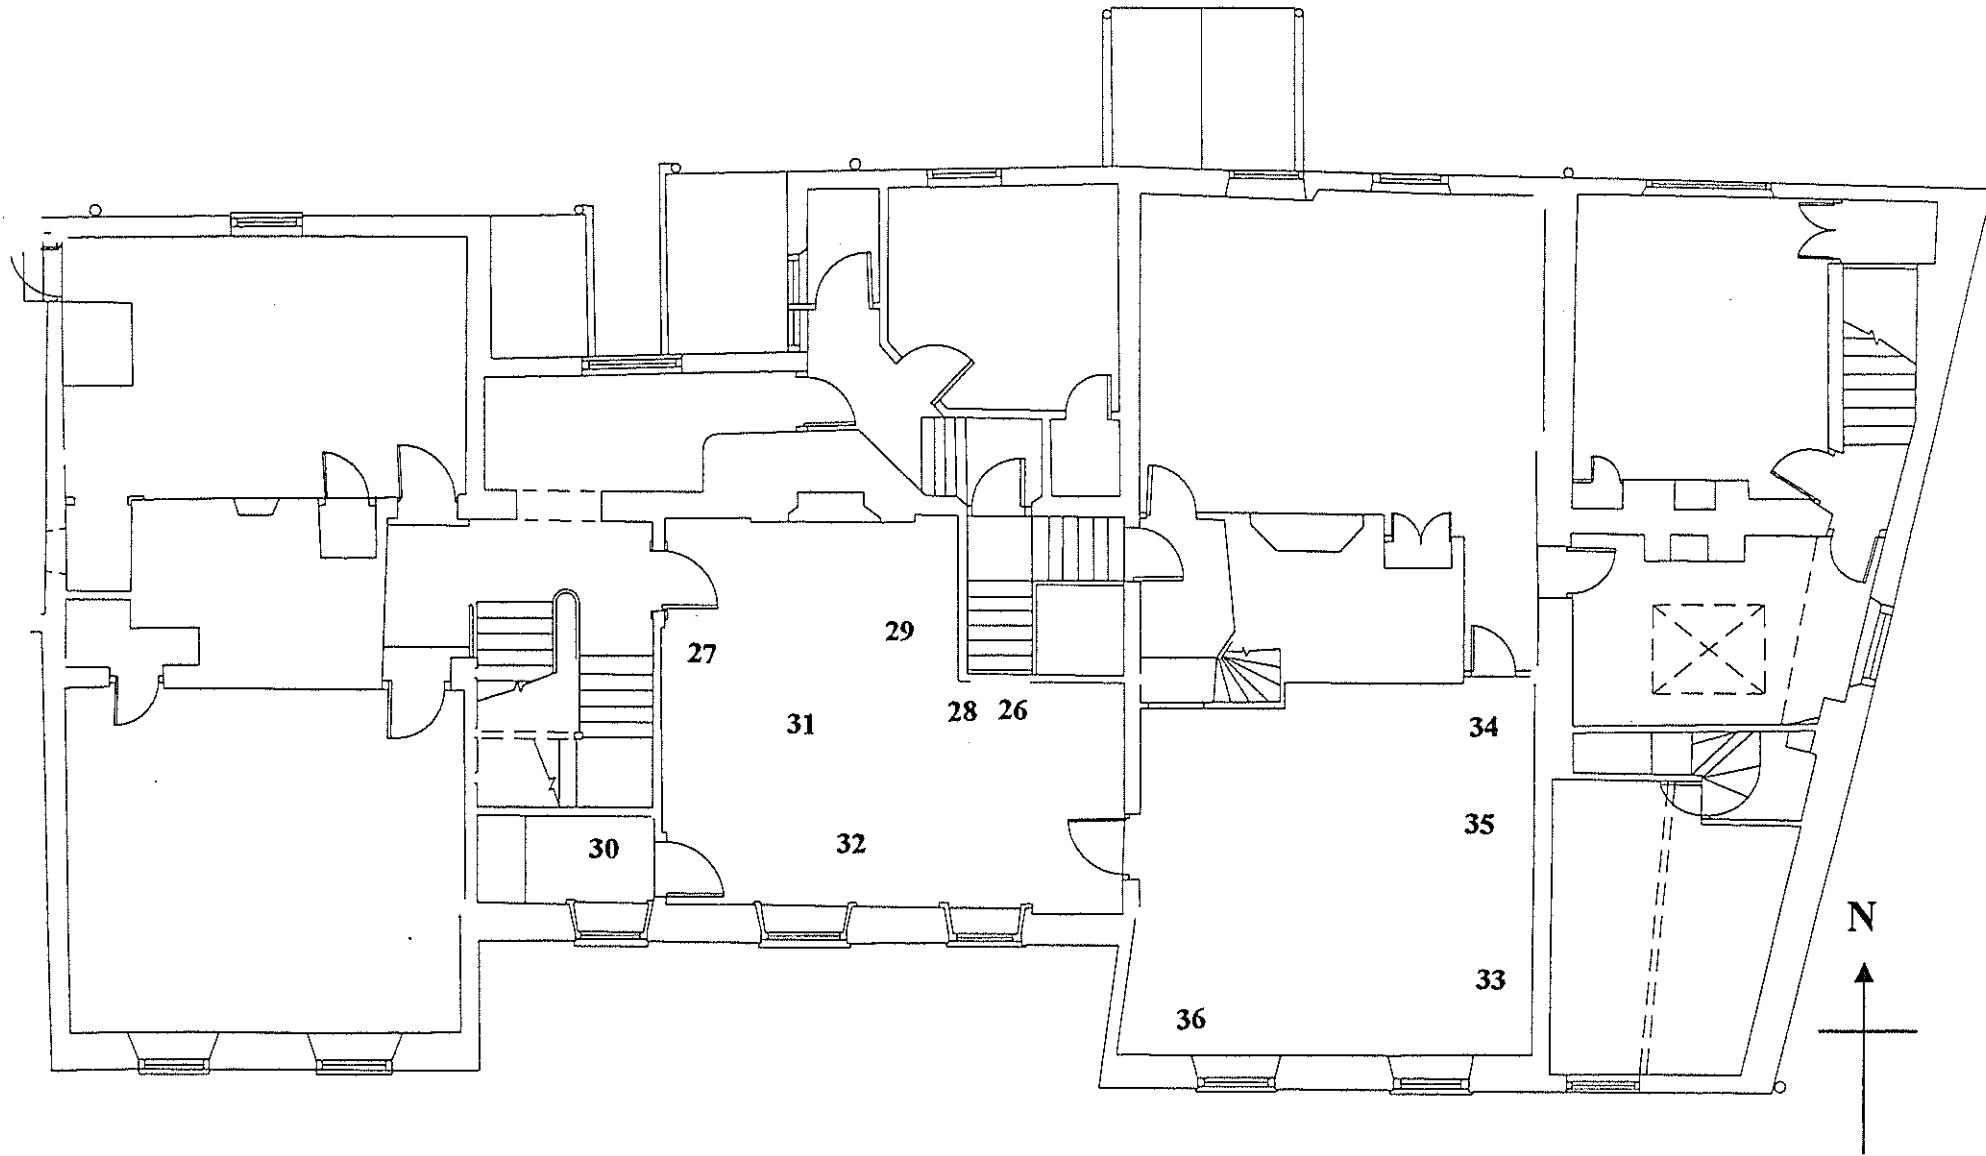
Plan at ground-floor level to show approximate position of timbers sampled
